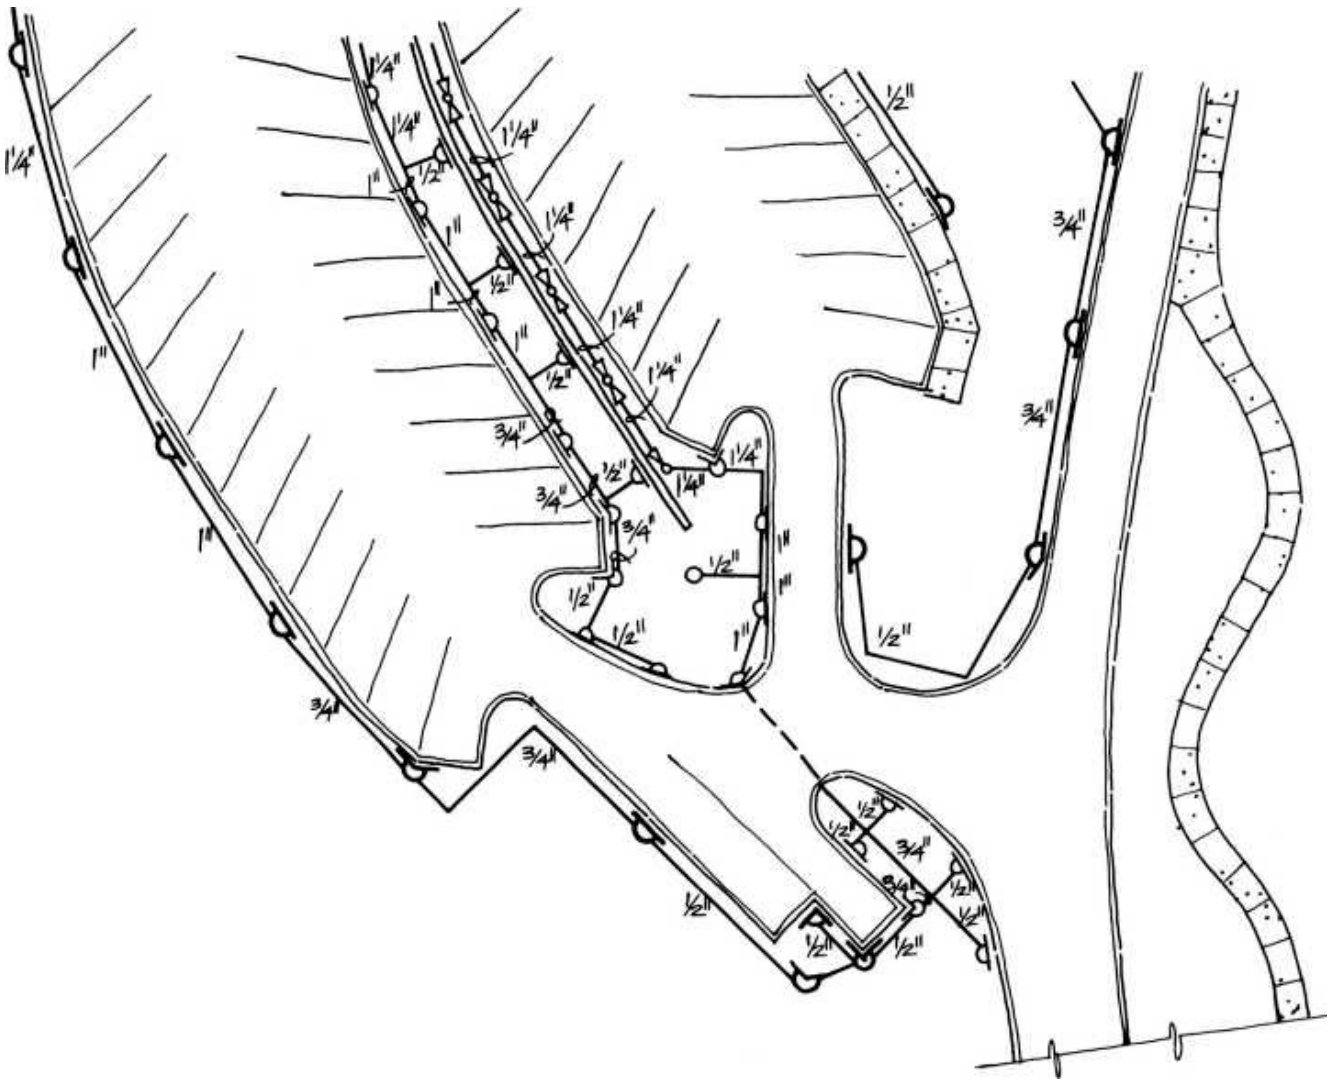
U.S. Army Corps of Engineers irrigation plan.
